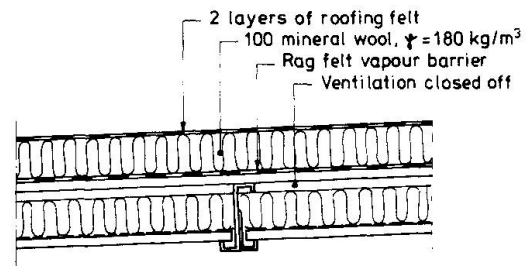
Roof construction after rebuilding. A vapour barrier of rag felt was glued to the roof to prevent air convection. Dripping from the ceiling has stopped.
